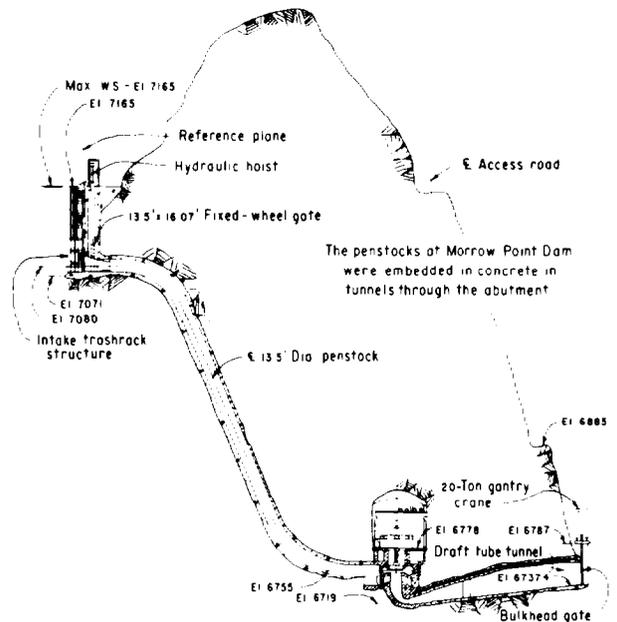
Embedded penstock in abutment tunnel. —288-D-3072
